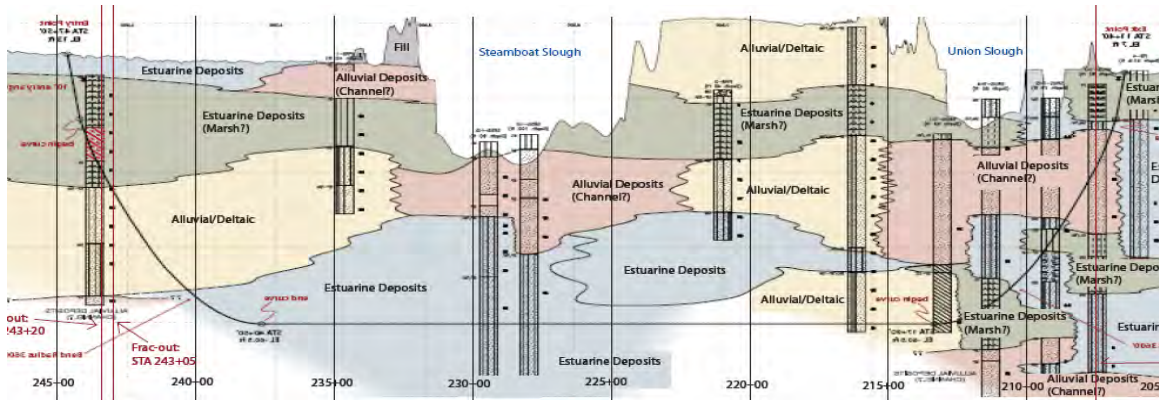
Geotechnical Cross Section for the 5-South Crossing
